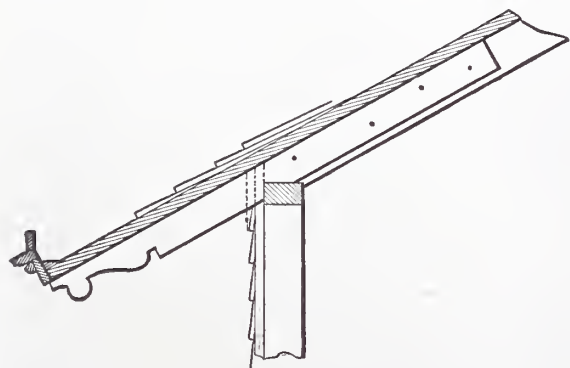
Section through Eaves.—Scale, ½ inch to the Foot.
